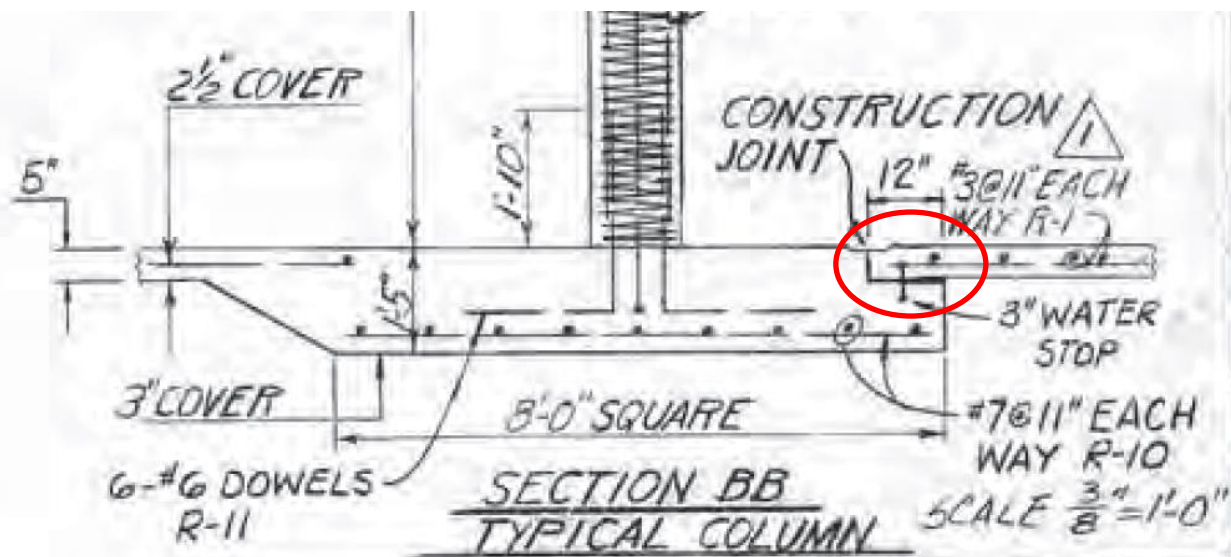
Unreinforced Expansion Joint, Drawing 10-S-10 from 1971 Drawings
